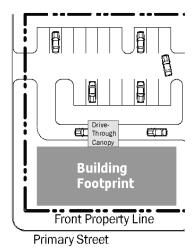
C (1). Recommended drive-through Facility layout.
